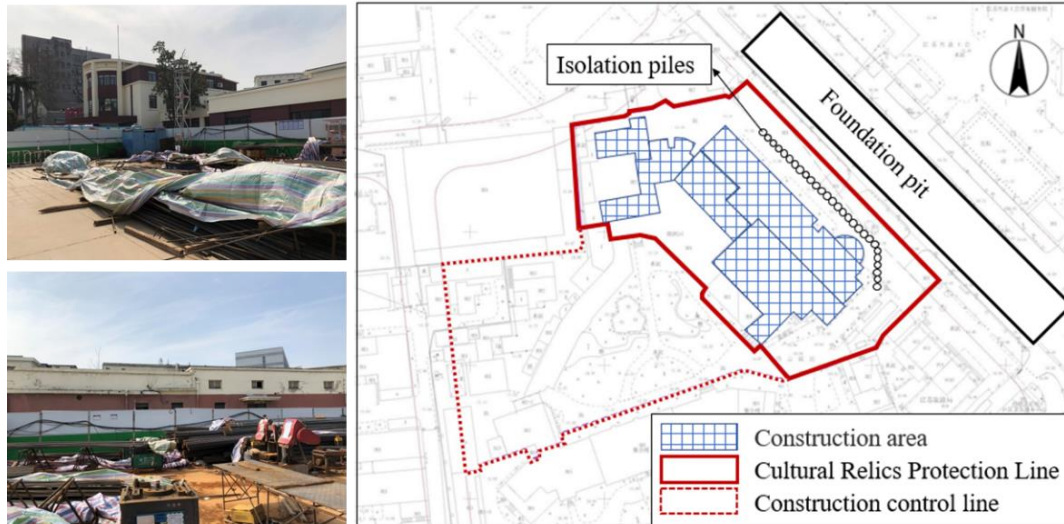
Location of the excavation and the protected buildings (the building on the photos is Nanjing Hotel and isolation piles are behind the fence)
